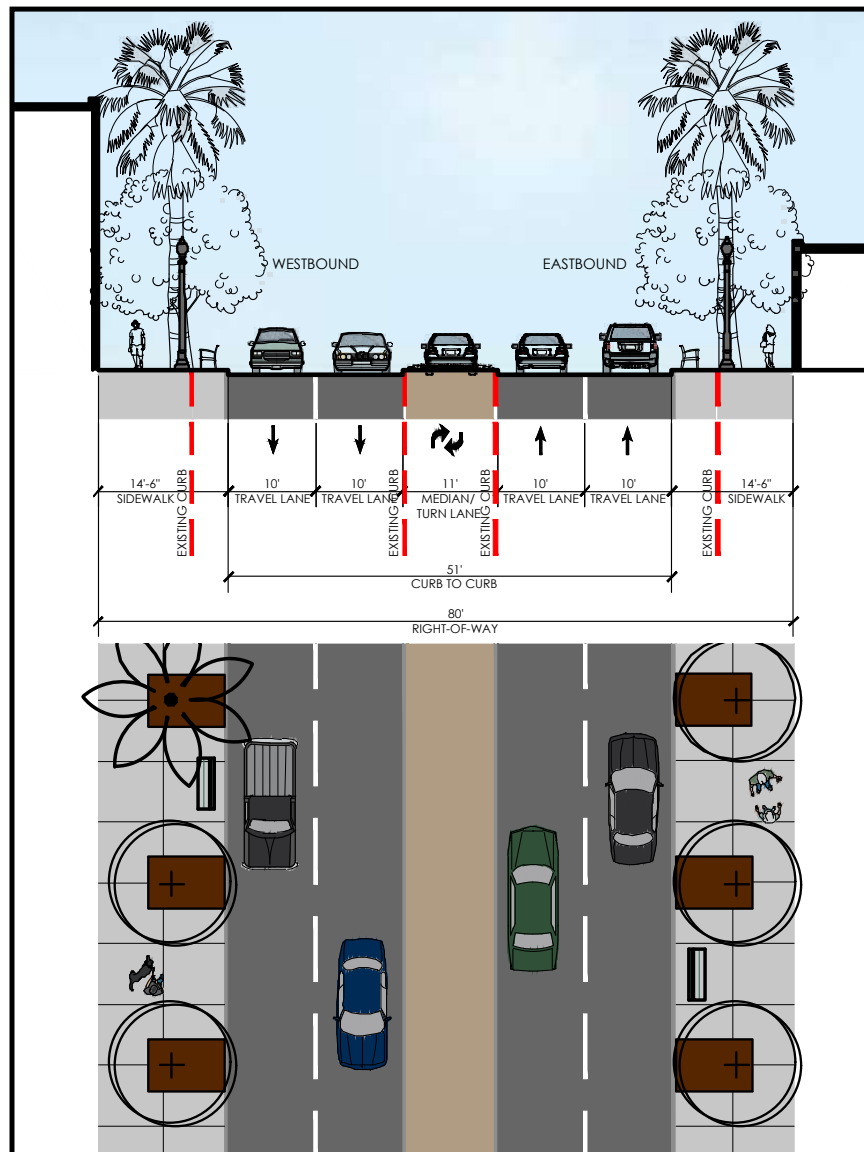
, Carlsbad Village Drive: Proposed Conditions
